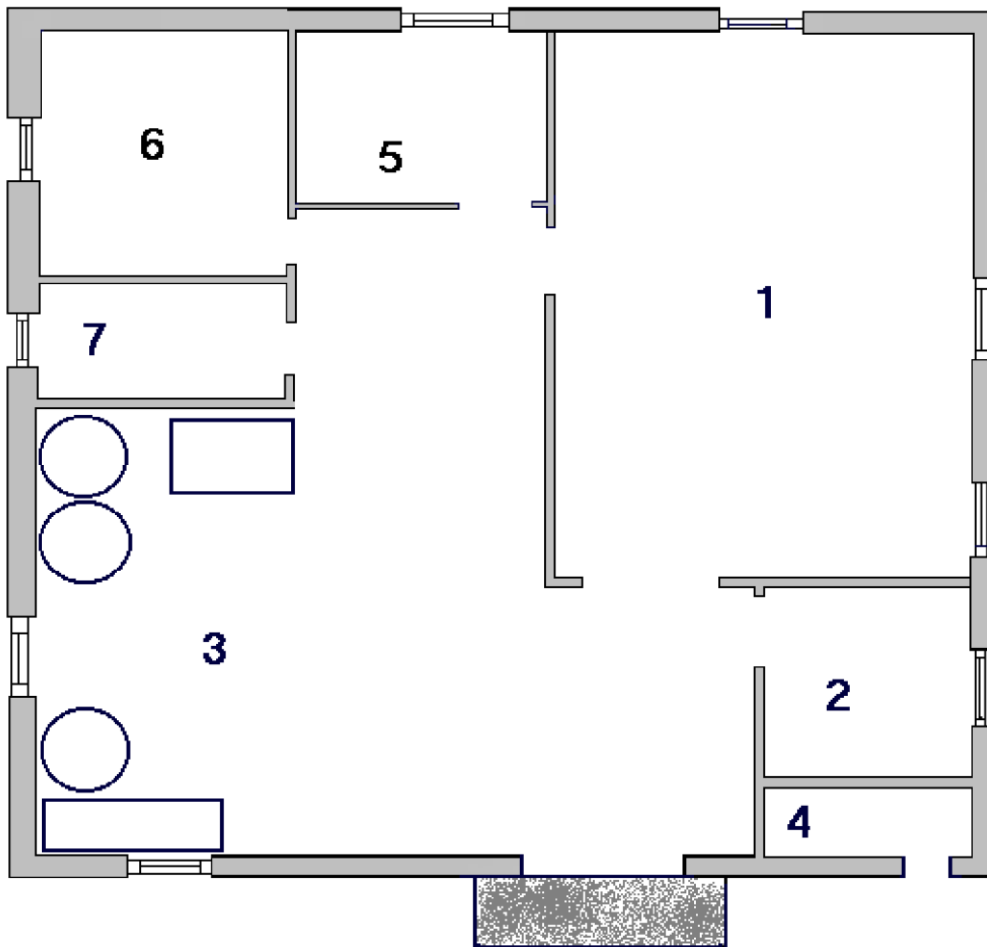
The floor plan (scale 1:200) of a beekeeping building (for about 250 colonies) is shown. The real dimensions can be altered according to the available area. The outside dimensions are 10 X 10 meters.
